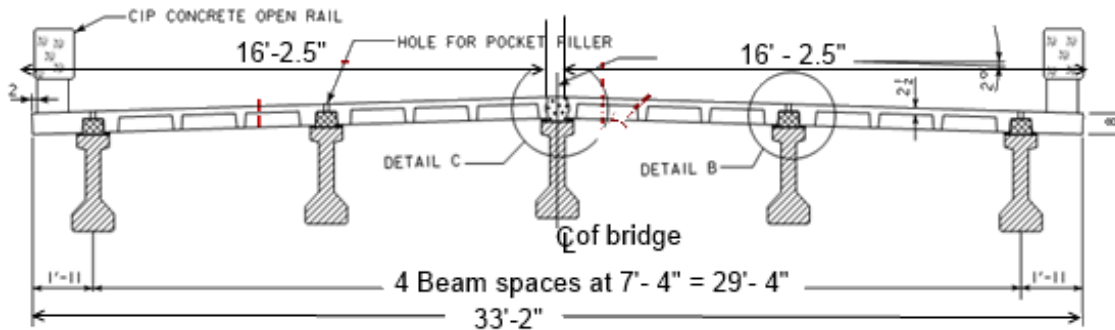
Cross-section of the UHPC waffle deck bridge designed for Wapello County Bridge in Iowa
